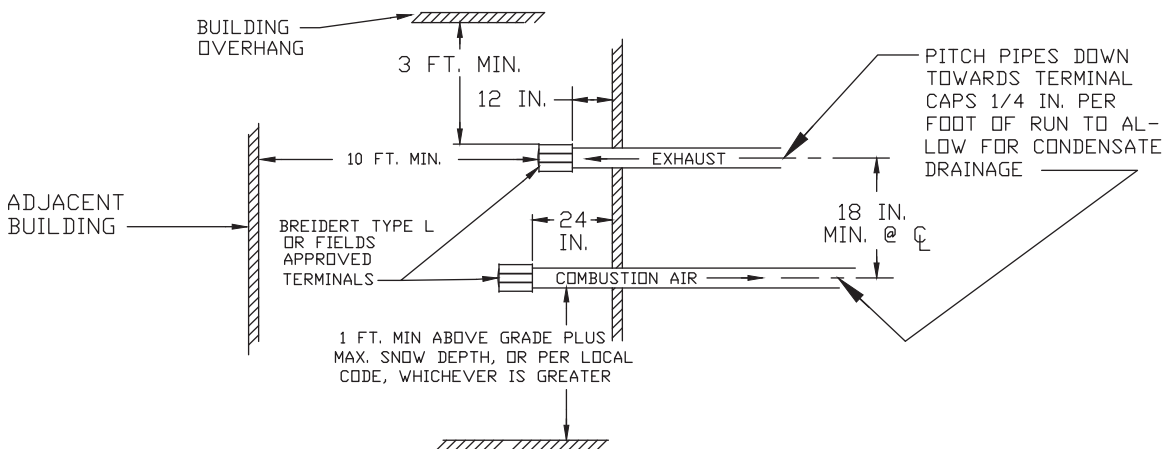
Vertical arrangement, single wall vent system to single wall termination; see Table 7 vent systems termination clearance requirements
